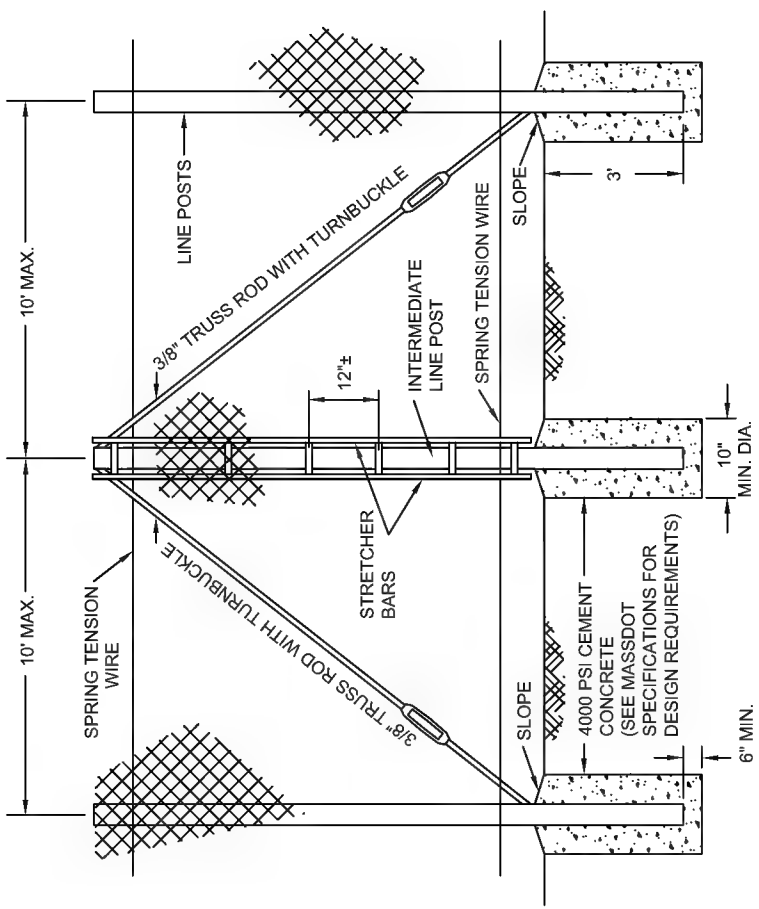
DETAIL SHOWING LINE POST SET IN CONCRETE FOOTING FOR DIMENSIONS SEE 404.5.0
